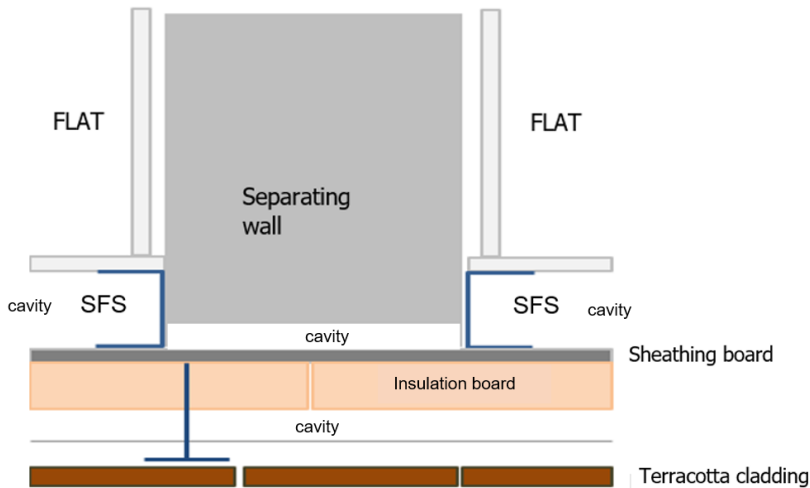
Compartment wall interface with terracotta cladding (plan view)
